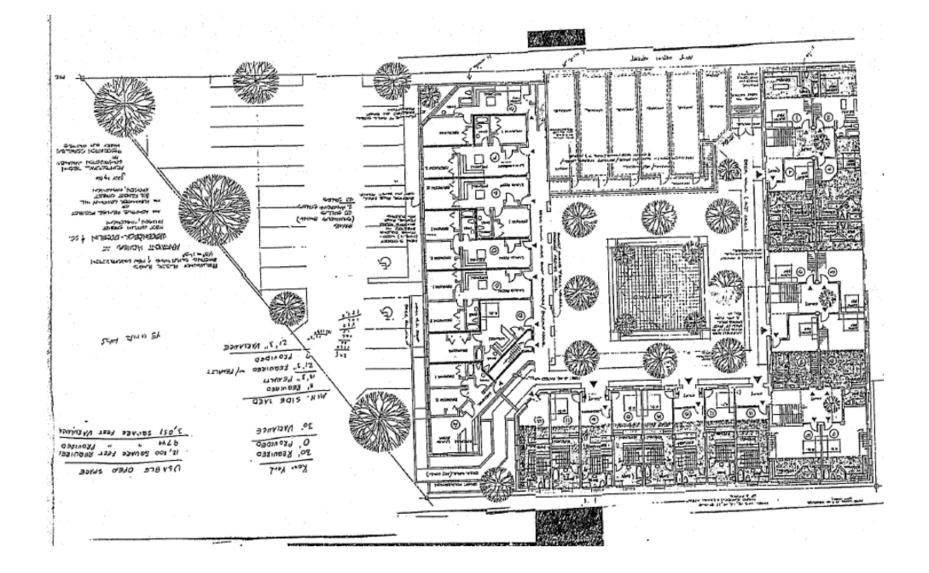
August 1986 site plan. This plan was replaced with a new lot configuration in June 1987. City of Madison Building Inspection Files, Madison, WI.
